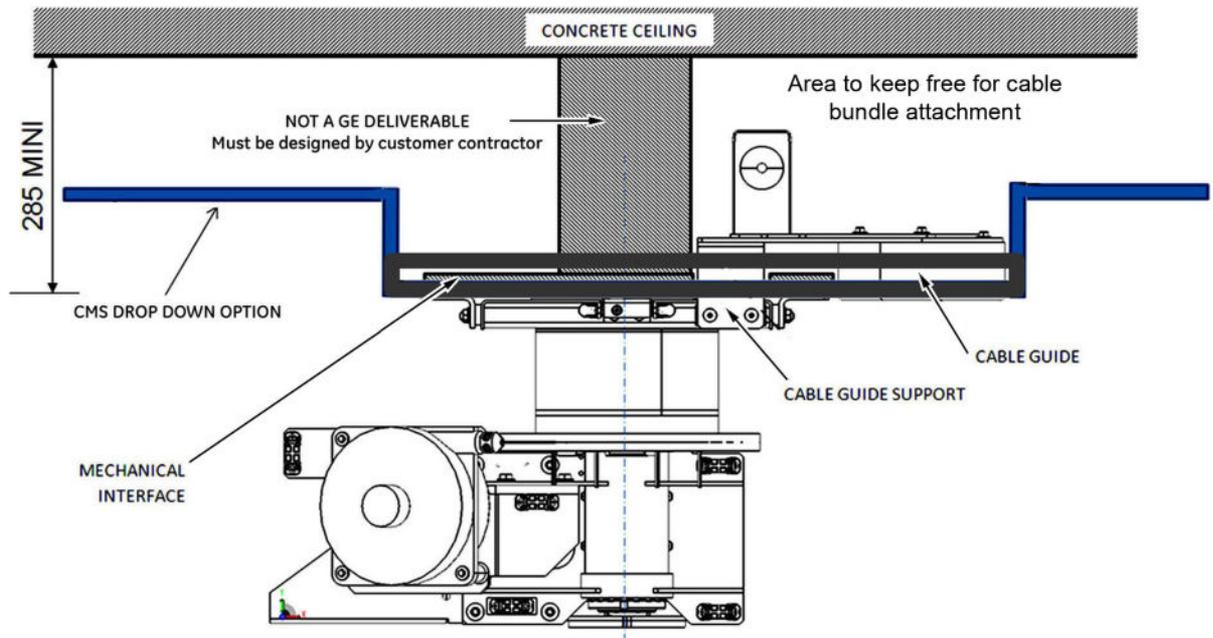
Mechanical interface with mechanical support or concrete ceiling
